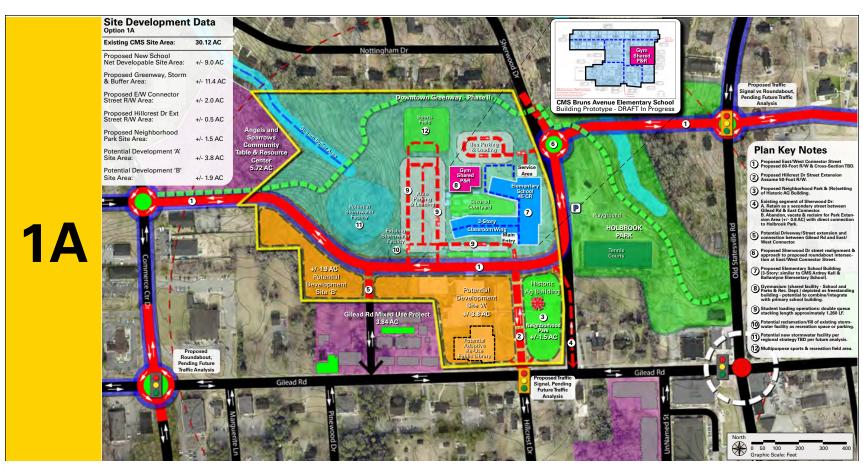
Potential Future CMS Huntersville Elementary School: Conceptual Site Plan: Scenario 1A.
